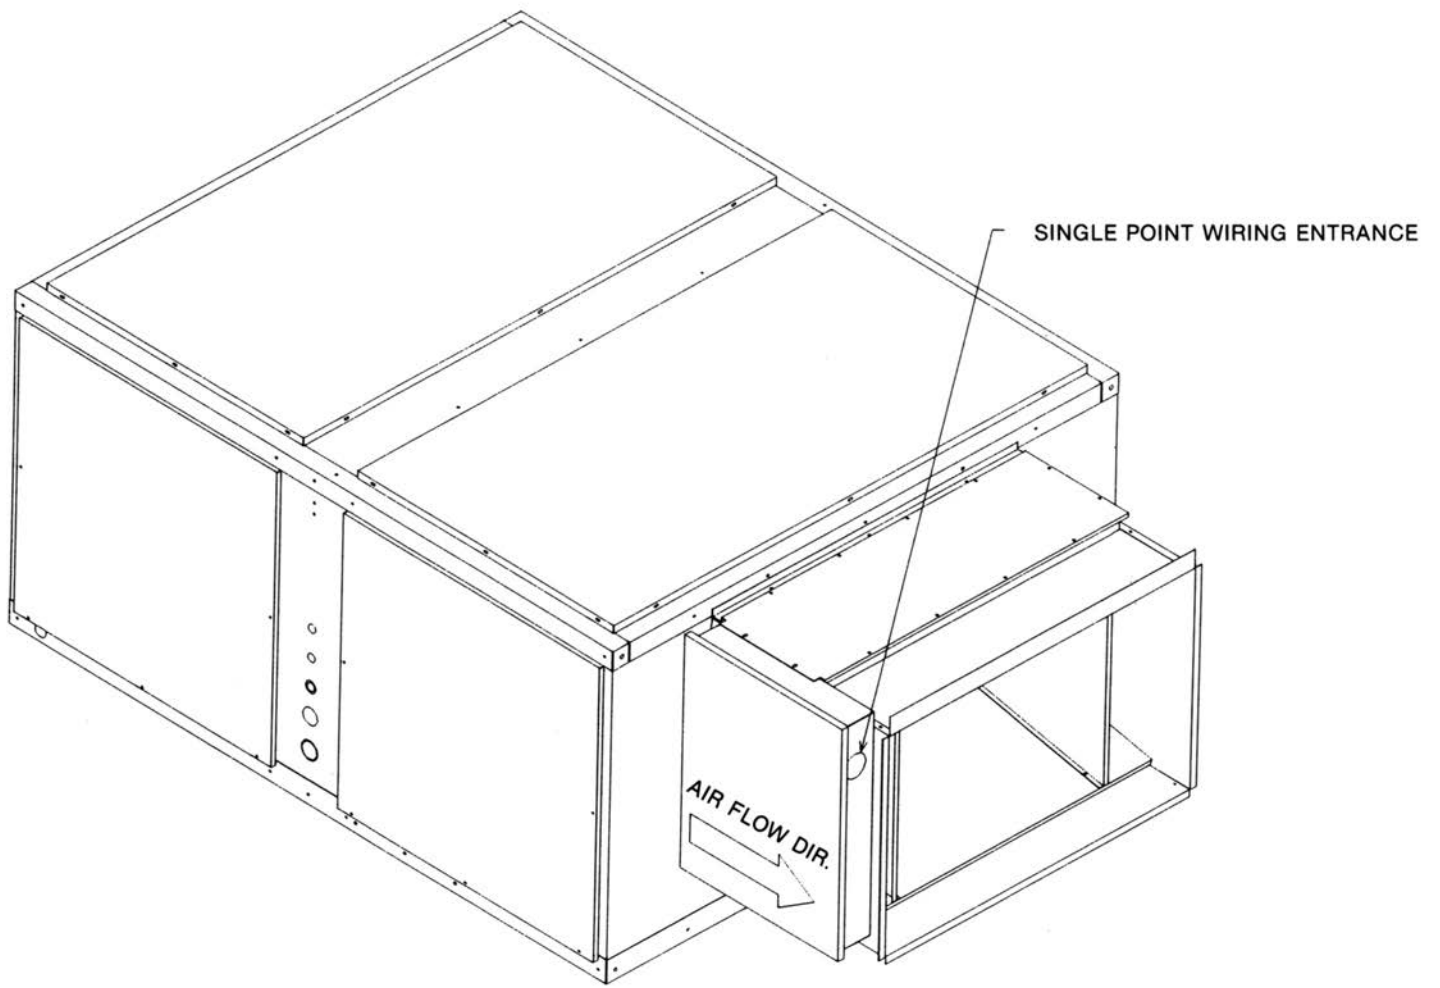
HEATER KIT INSTALLED TO AIR HANDLER
